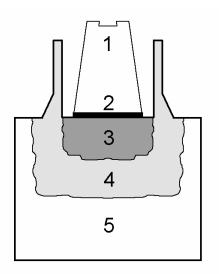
A Scheme of a Foundation Under a Hammer Reconstructed with SFRC (1- Anvil, 2-Shock Absorption Pad, 3- SFRC, 4- Ordinary Concrete, 5- Old Concrete Block) (Jamrozy 1983).
